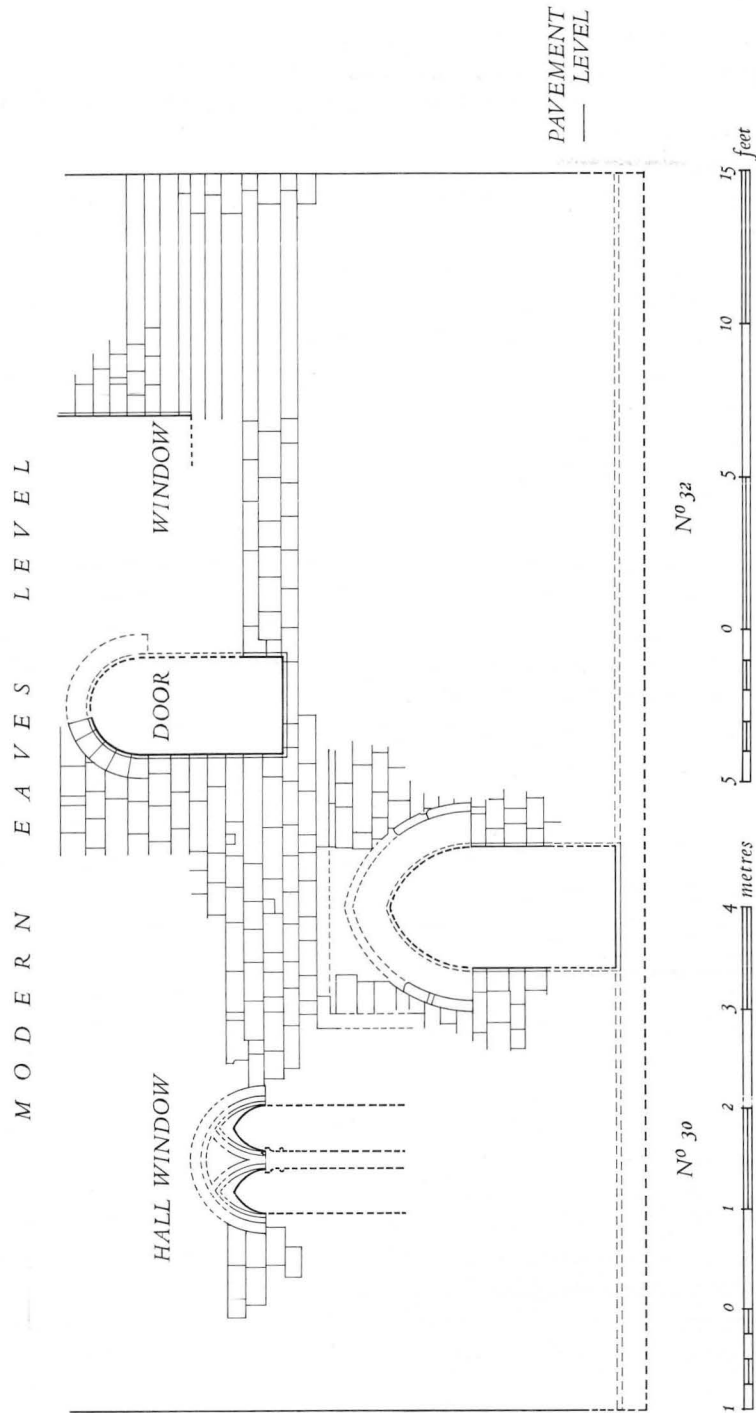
Elevation of the front wall of Nos. 30 and 32 (33). Scale 1: 75.
